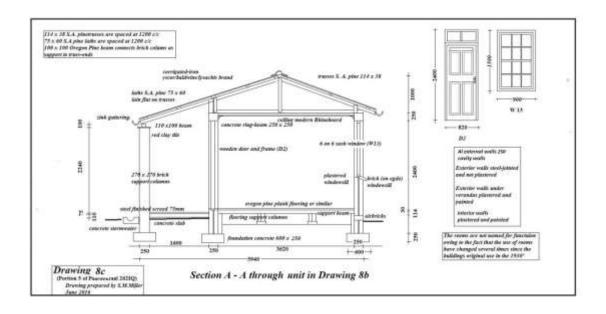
Above. Section A – A through unit in Drawing 8. (Drawing S.M. Miller 2016.)
